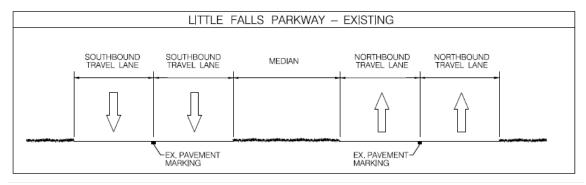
Existing Road Section in 2016 between Arlington Rd and MD 190
